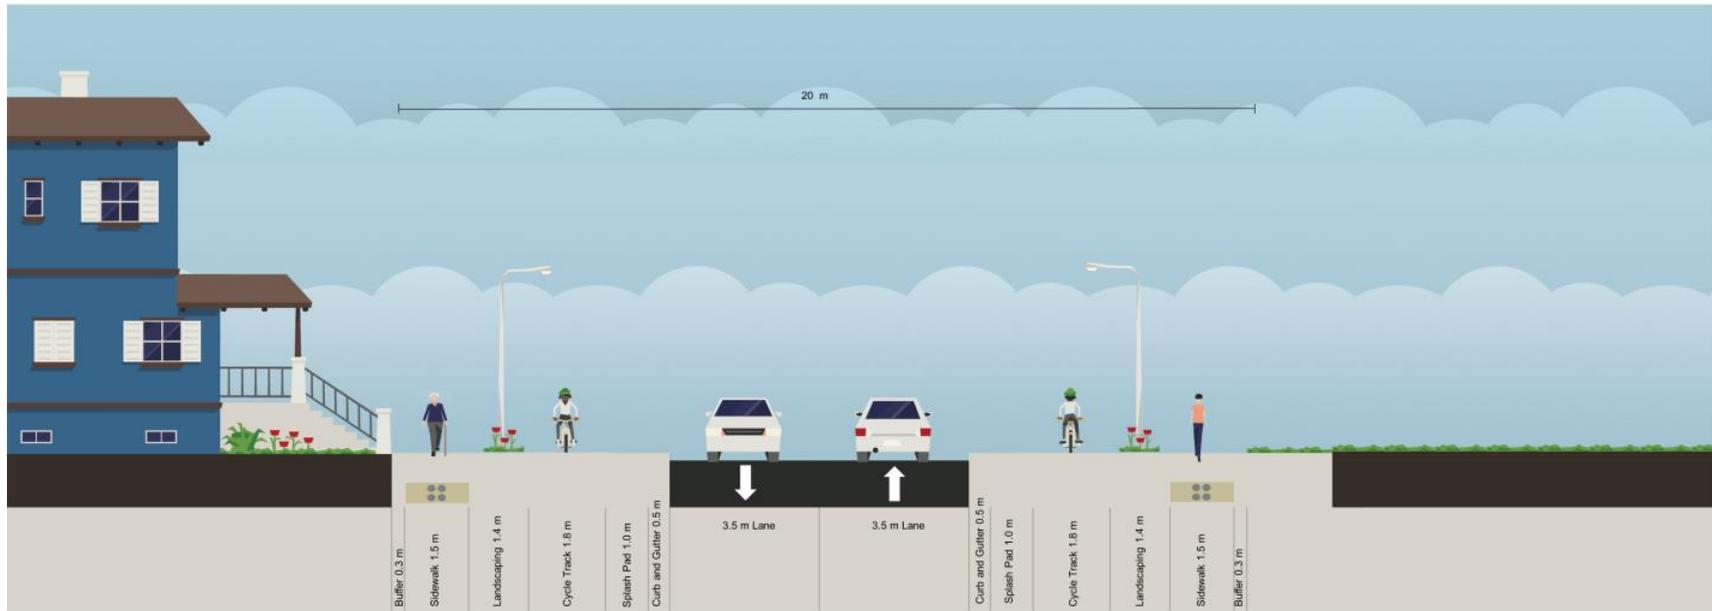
Area 3 Preferred Typical Cross-Section
